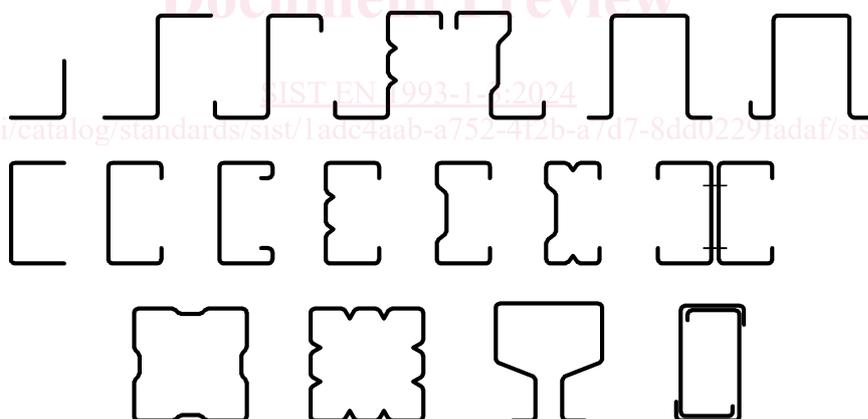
Typical cross-sectional shapes of cold-formed members
